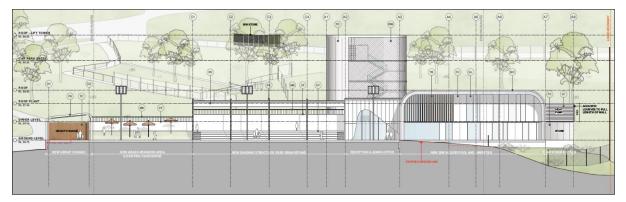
Eastern elevation of proposed works (Source: Brewster Hjorth Architects)
